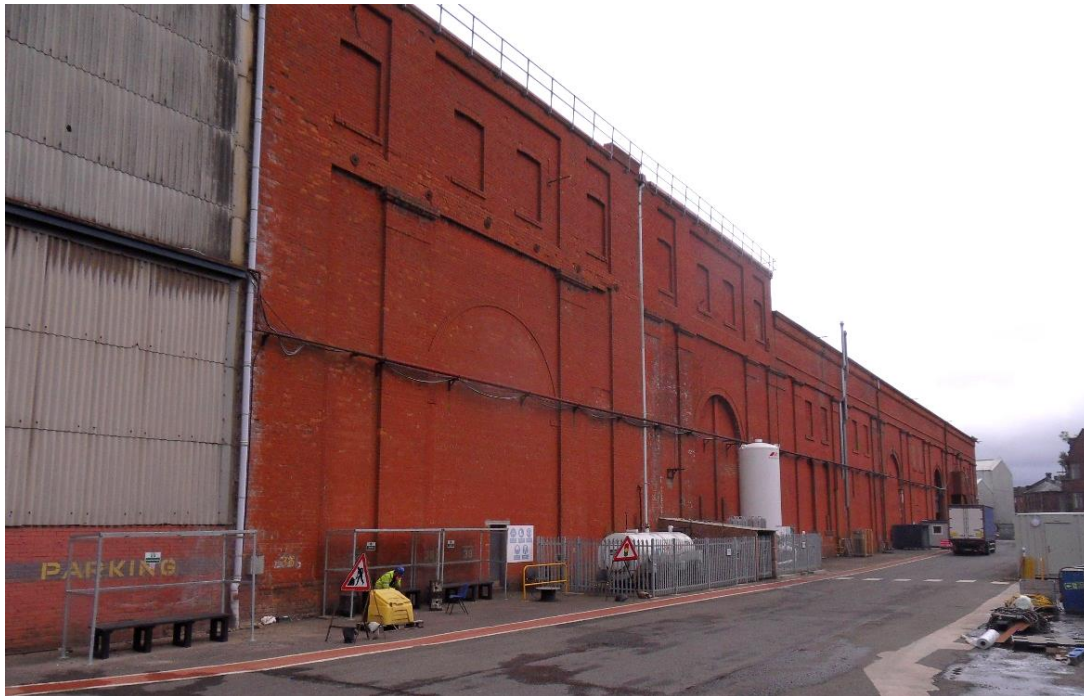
View facing north-east towards MM007, note the difference between the eastern 1871 section and the 1906 and 1916 western extension.
